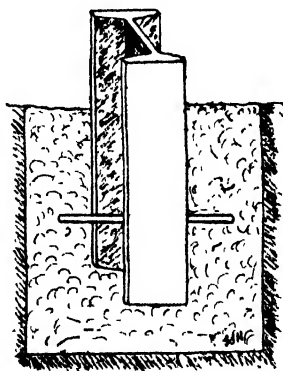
Method of fixing end of angle-iron or steel pillar.
